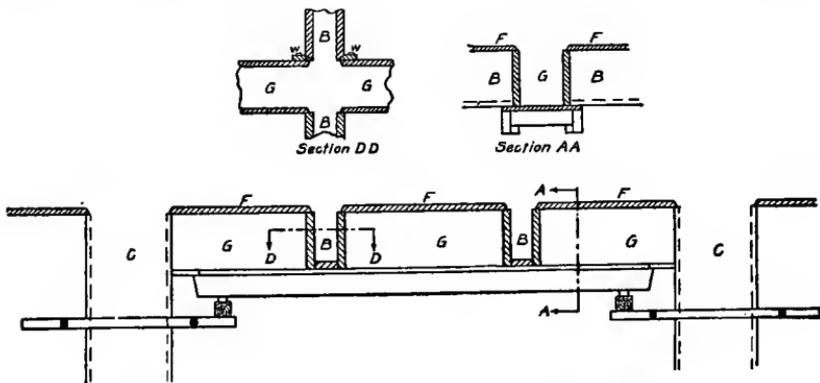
FORMS FOR COLUMN, GIRDER, BEAM, AND FLOOR.
